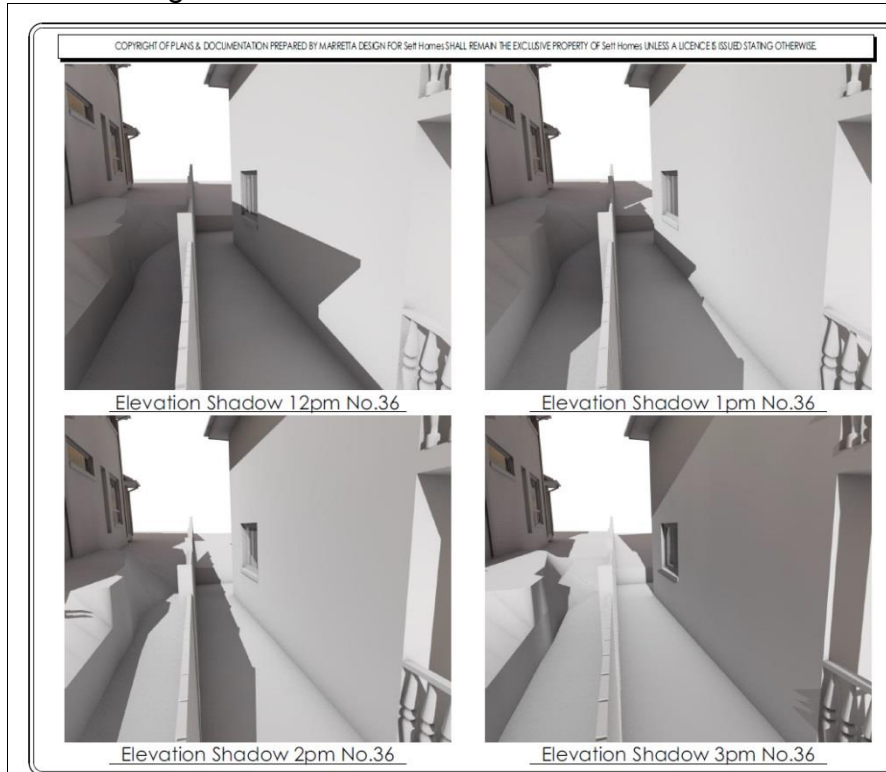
Elevation shadow diagram Sheet 07 of 17 prepared by SETT Homes
